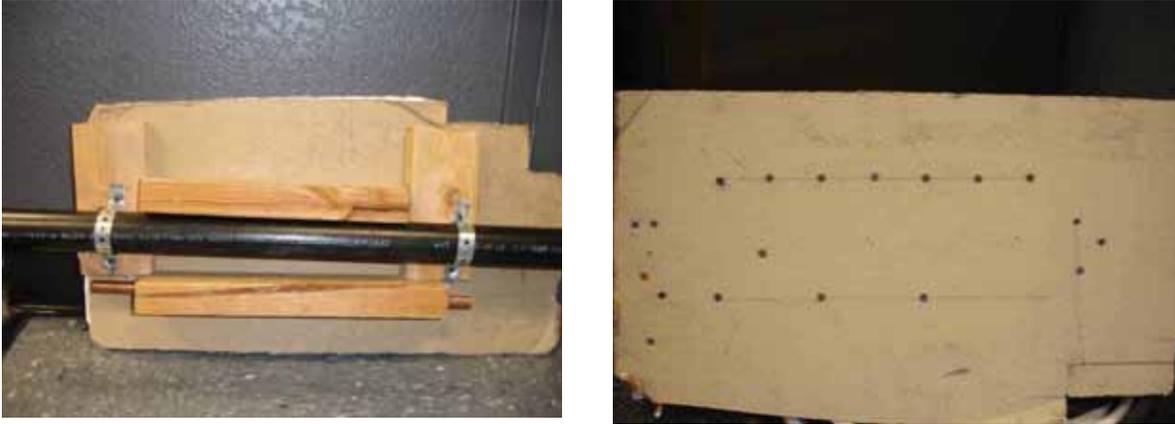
The back and front of a test jig for screw-into-pipe defects.
